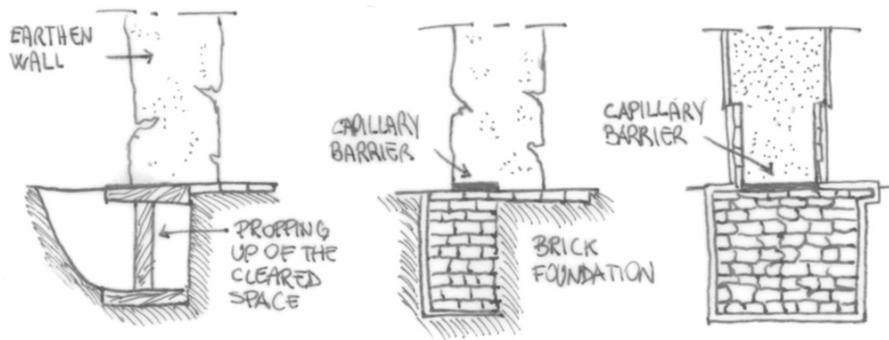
Insertion of a stone/terracotta brick foundation
